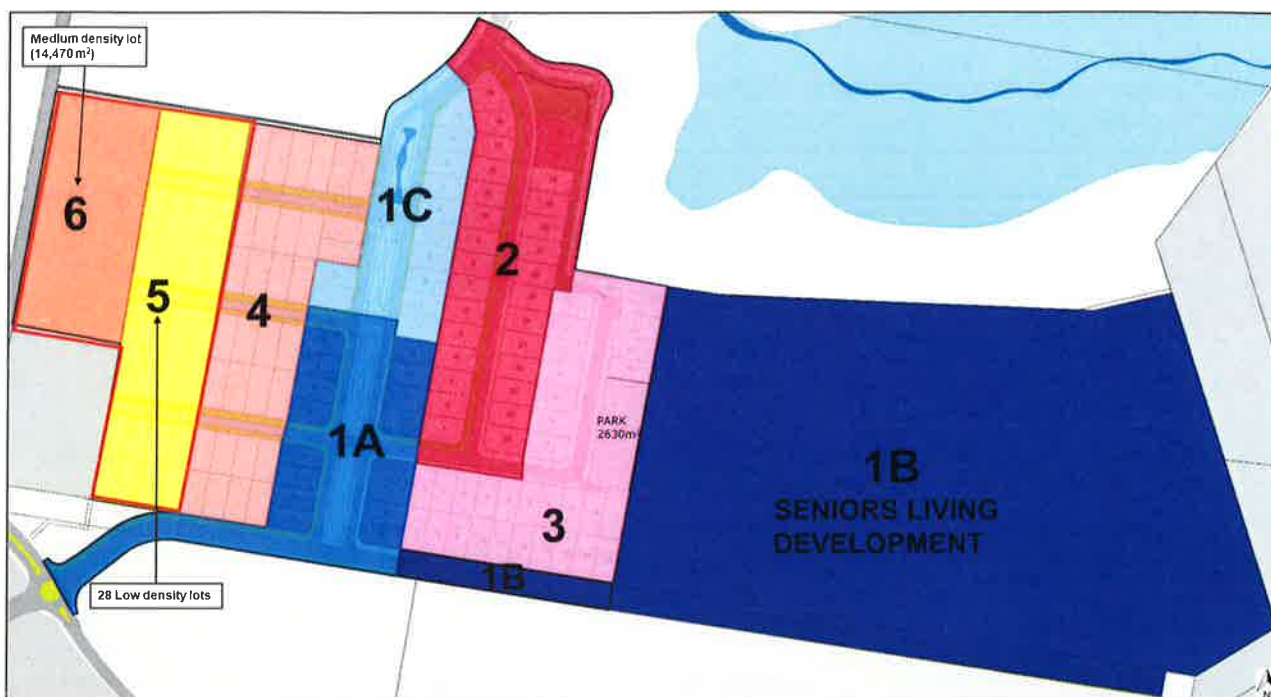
Project Approval staging plan (the modification site highlighted red) (Source: MP08_0167 MOD 3)
